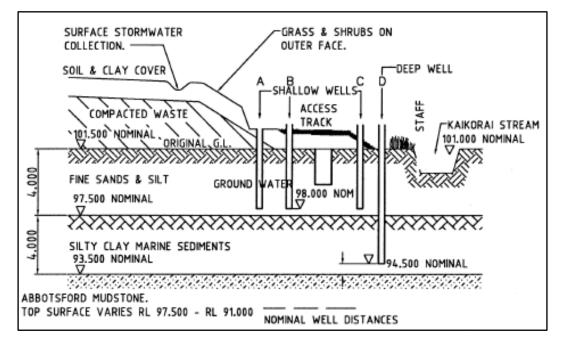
Schematic cross section through an example monitoring well line and the leachate collection trench (Source DCC Landfill Annual Survey Plans – July 2004 Sheet No. G11).
